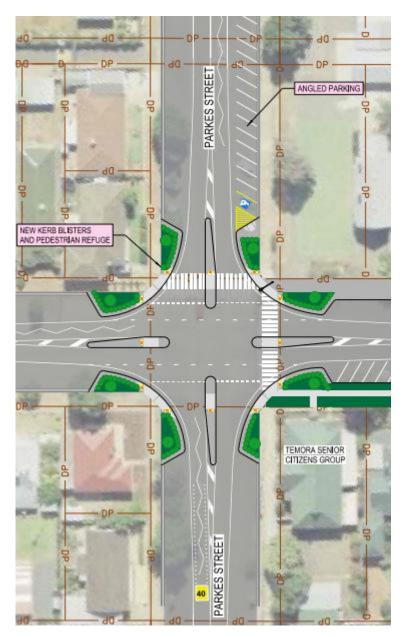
Concept upgrades Parkes Street/De Boos Street intersection
